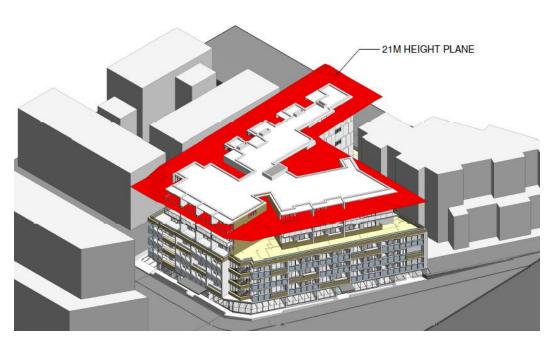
illustration of the proposal as modelled against the 21m building height plane
